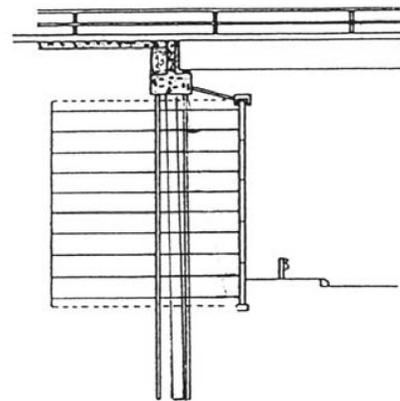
illustrates use of pile encased in a pressure-relieving sleeve that isolates the pile movements from the surrounding soil. Hassiotis (2007) has reported tests with an integral abutment supported on pile encased in corrugated steel sleeves backfilled with sand. Lui et al (2005) indicate that the Iowa DOT criteria for use of MSE walls with integral abutments requires each pile to be encased in a corrugated metal sleeve. The reinforced soil should include sand up to the bottom of the sleeve and the remainder should be filled with bentonite to the top of the sleeve.
